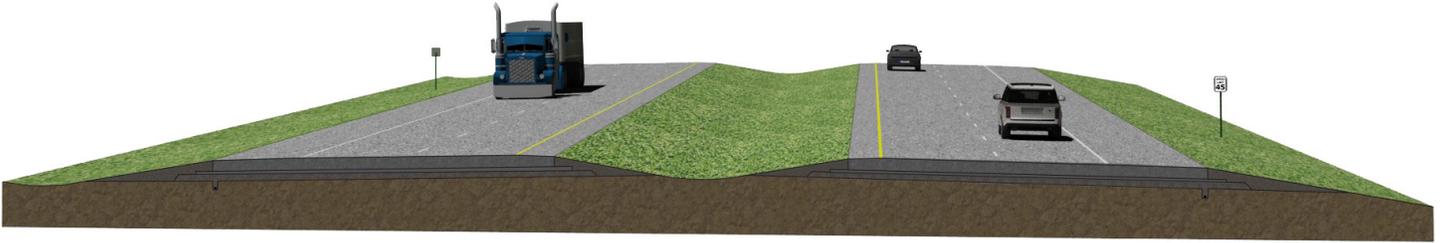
OPEN SECTION DIVIDED FOUR LANE TYPICAL SECTION FROM BEGINNING OF PROJECT TO BORDER AVENUE
